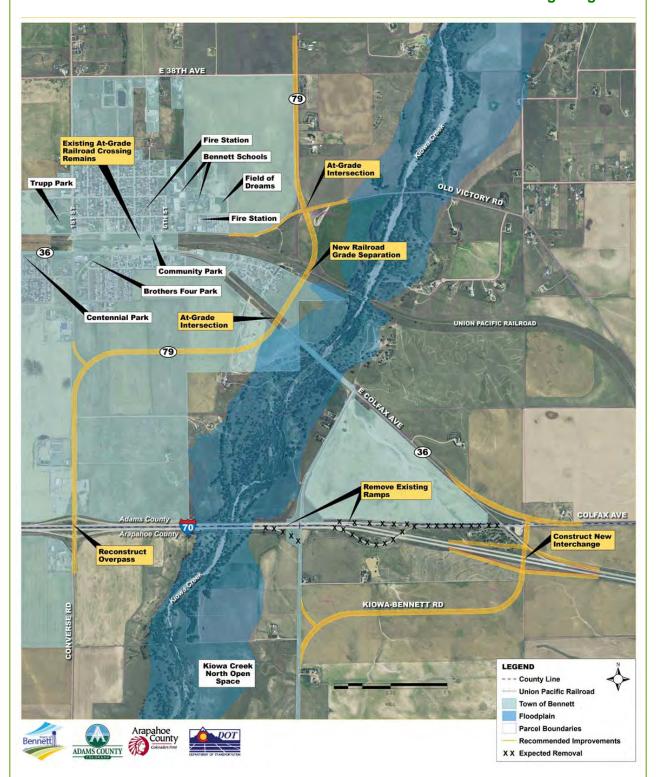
Alternative 4 - East Railroad Crossing with East Kiowa-Bennett Road Interchange Alignment
